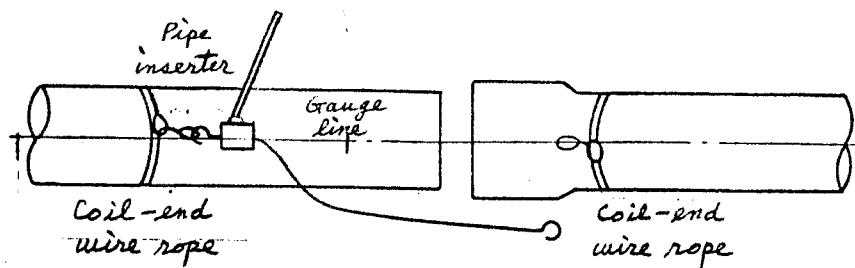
JOINING PIPE TO SOCKET-END PIPE
